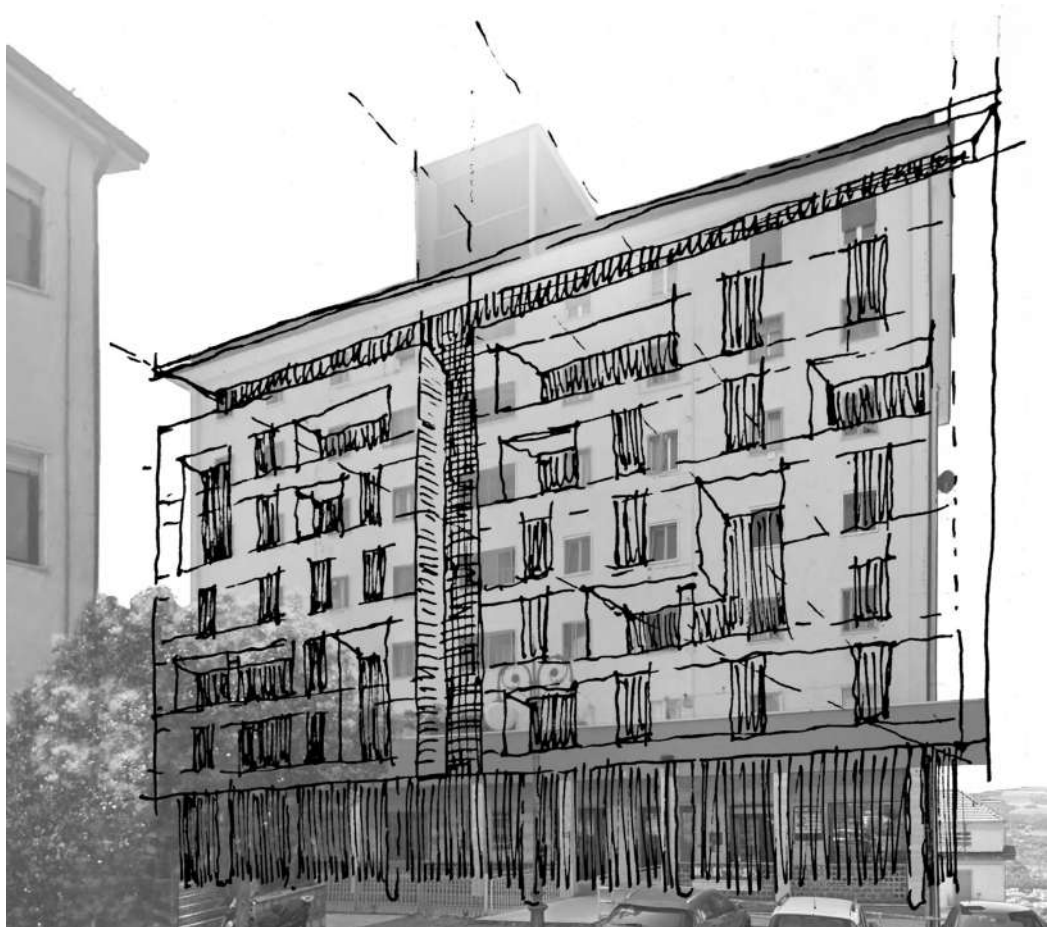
Sketches and design considerations on elevation of building considered for retrofitting act.
